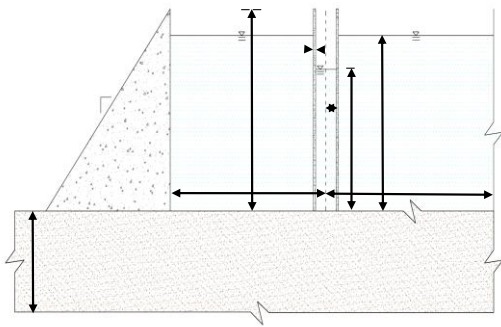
The geometry of the intake tower, dam, water and foundation system.
